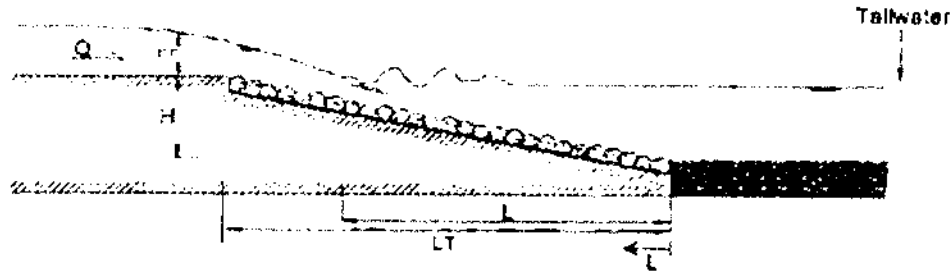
Typical L-profile of block ramps in submerged condition (Pagliara et al., 2008)
